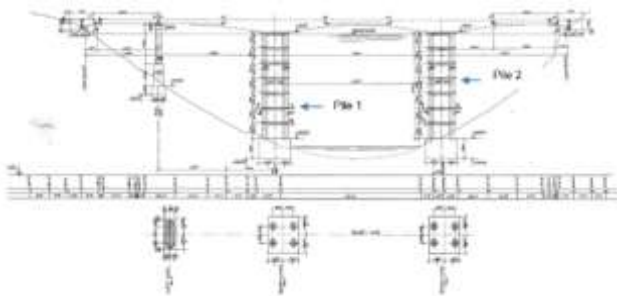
Longitudinal profile and plan view of bridge over Black Drini River
